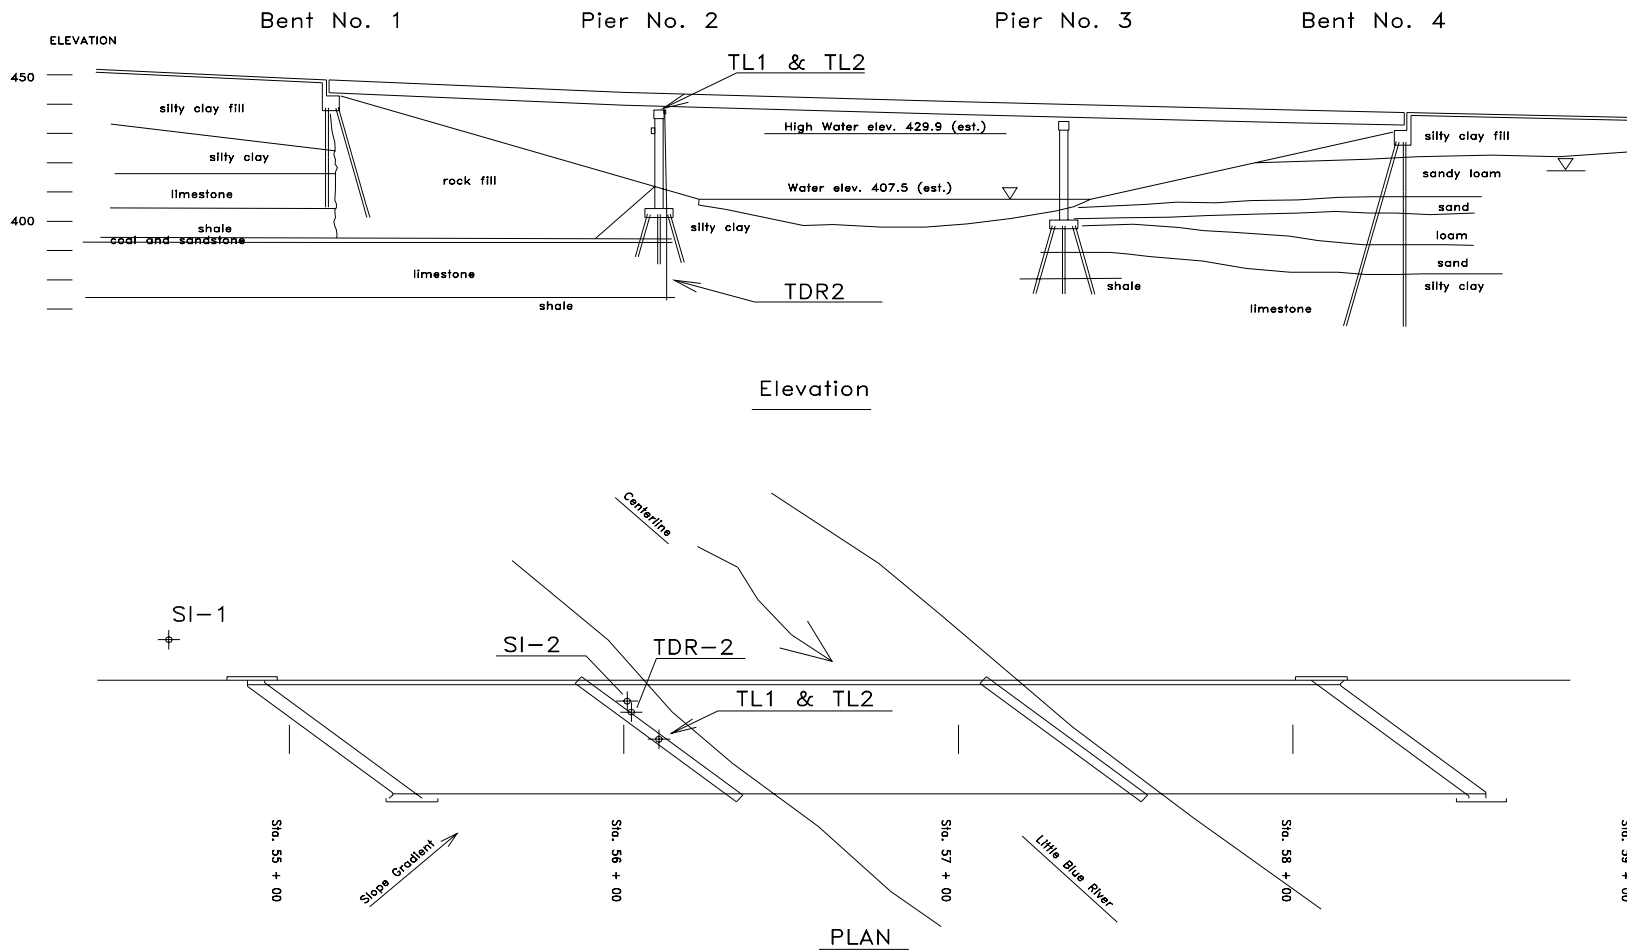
Elevation and Plan view of the bridge on S.R. 62 over the Little Blue River , Crawford county, IN.
